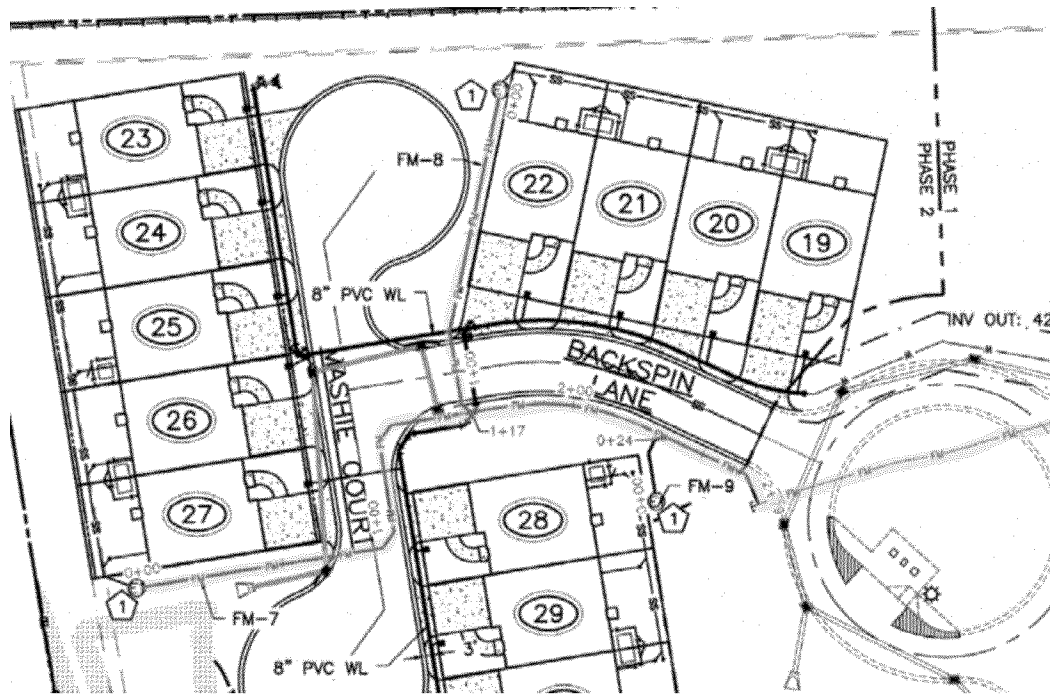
Sewer force main pipe locations along Mashie Court and Backspin Lane
